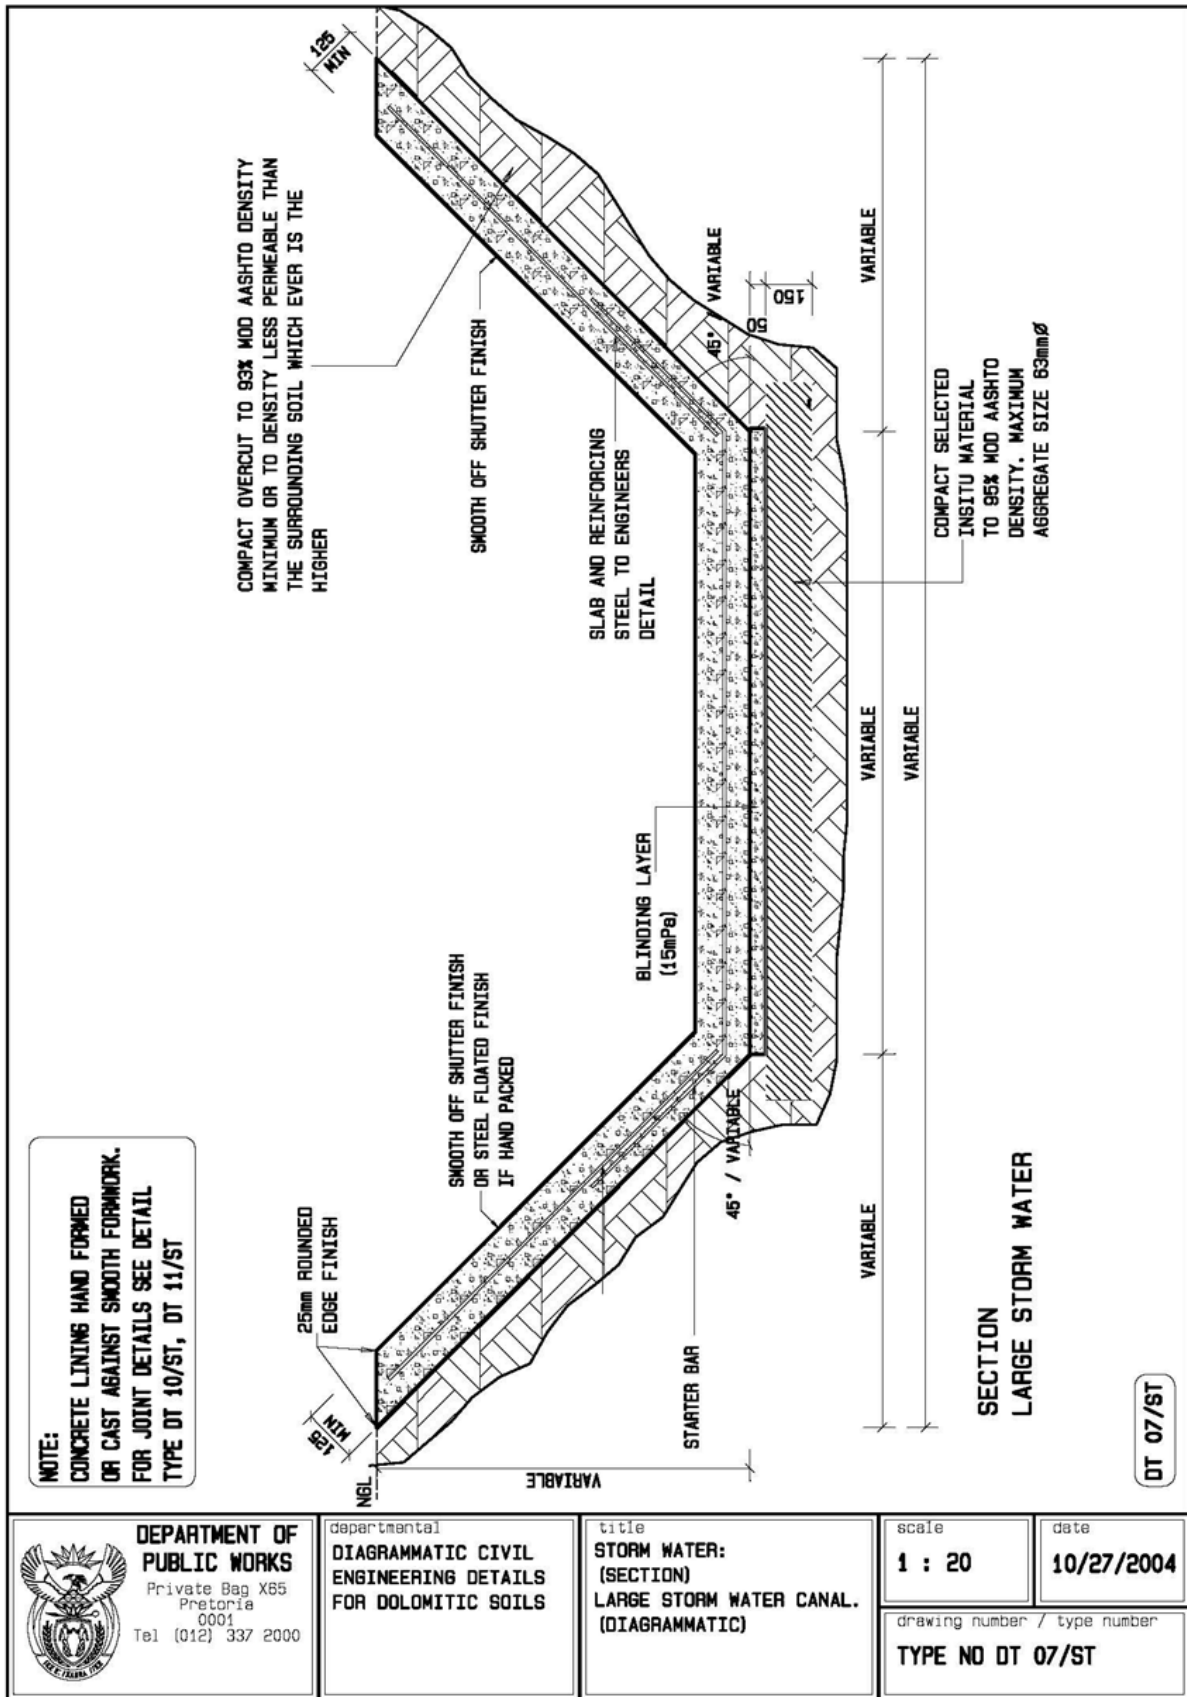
Typical Trapezoidal Stormwater Canal for Dolomitic Areas
